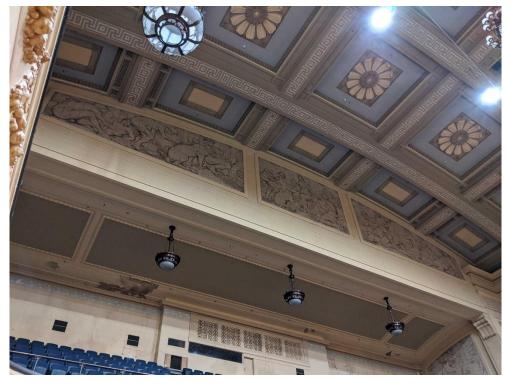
View of the rear (south) wall and ceiling treatment above the balcony seating prior to repair works (2022)
